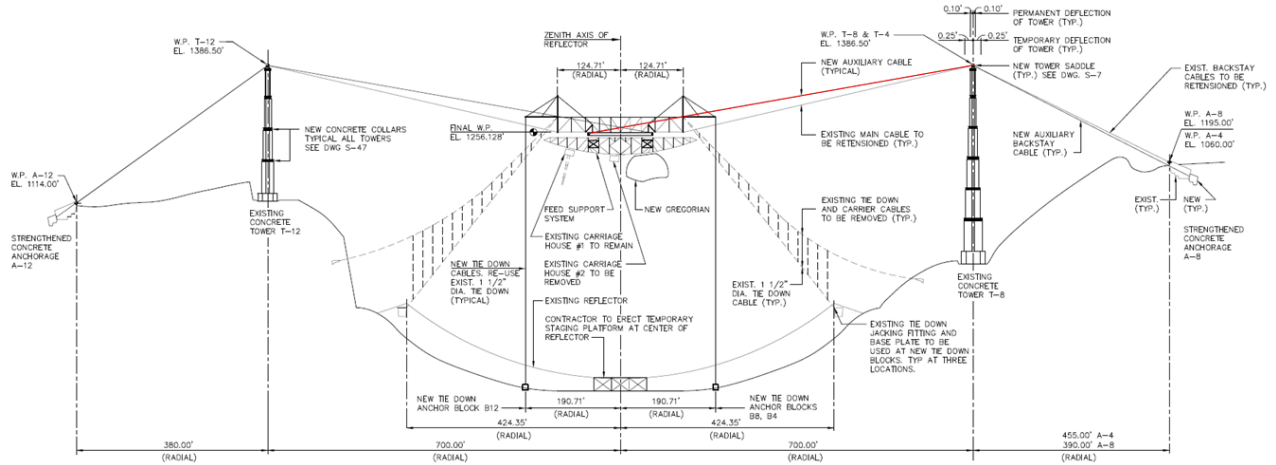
Elevation Drawing S-2, highlighting Failed Aux M4N Cable in Red
